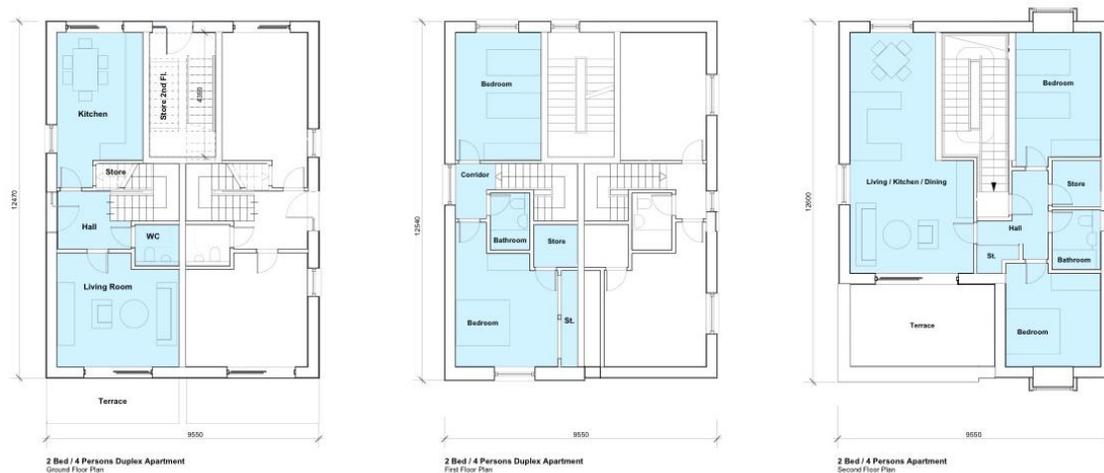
Floor Plans 2-Bed Duplex / 2-Bed Apt
